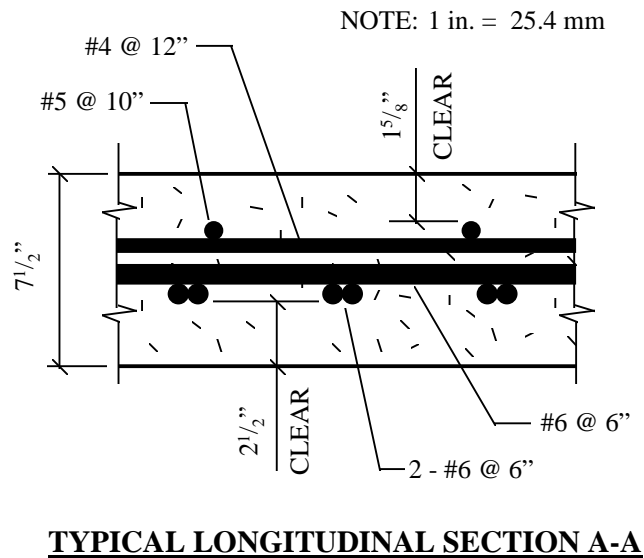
Typical longitudinal section through cast-in-place test specimens.
